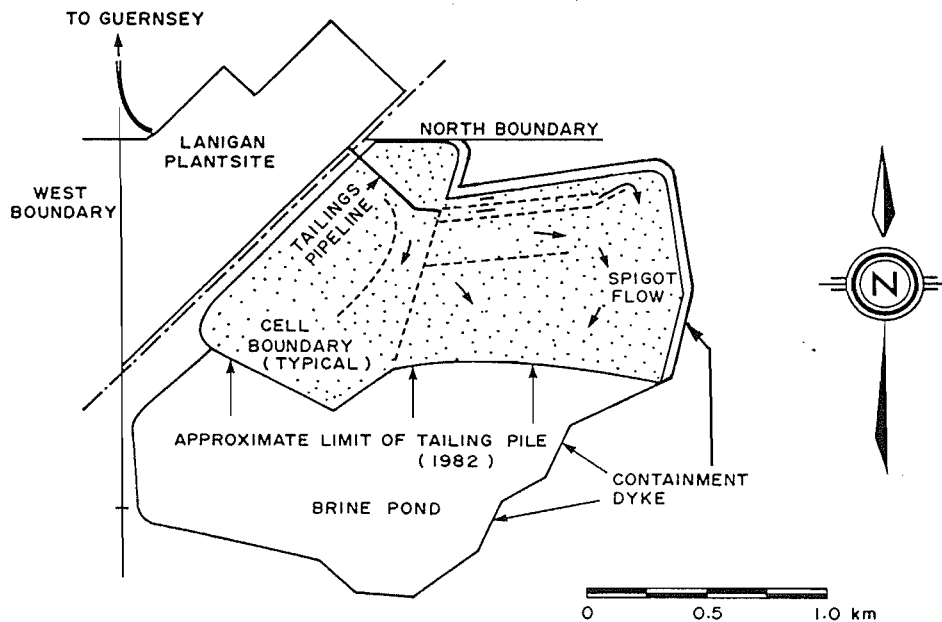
Aerial layout of the PCS waste-containment facility at Lanigan, Saskatchewan.
